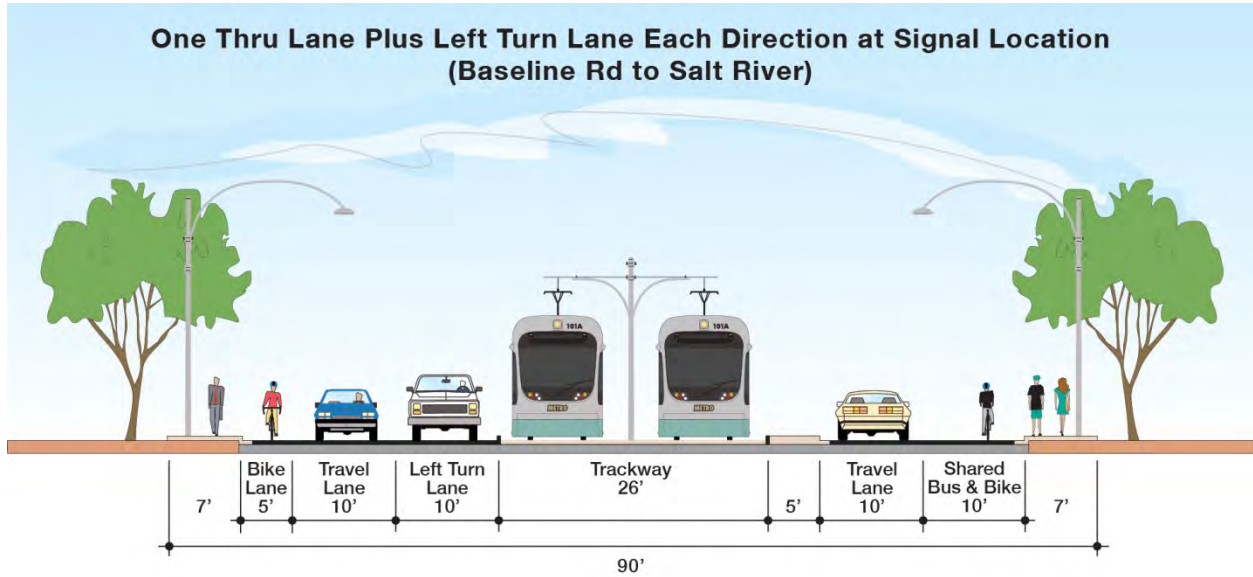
TYPICAL CROSS SECTION – SIGNAL LOCATION
